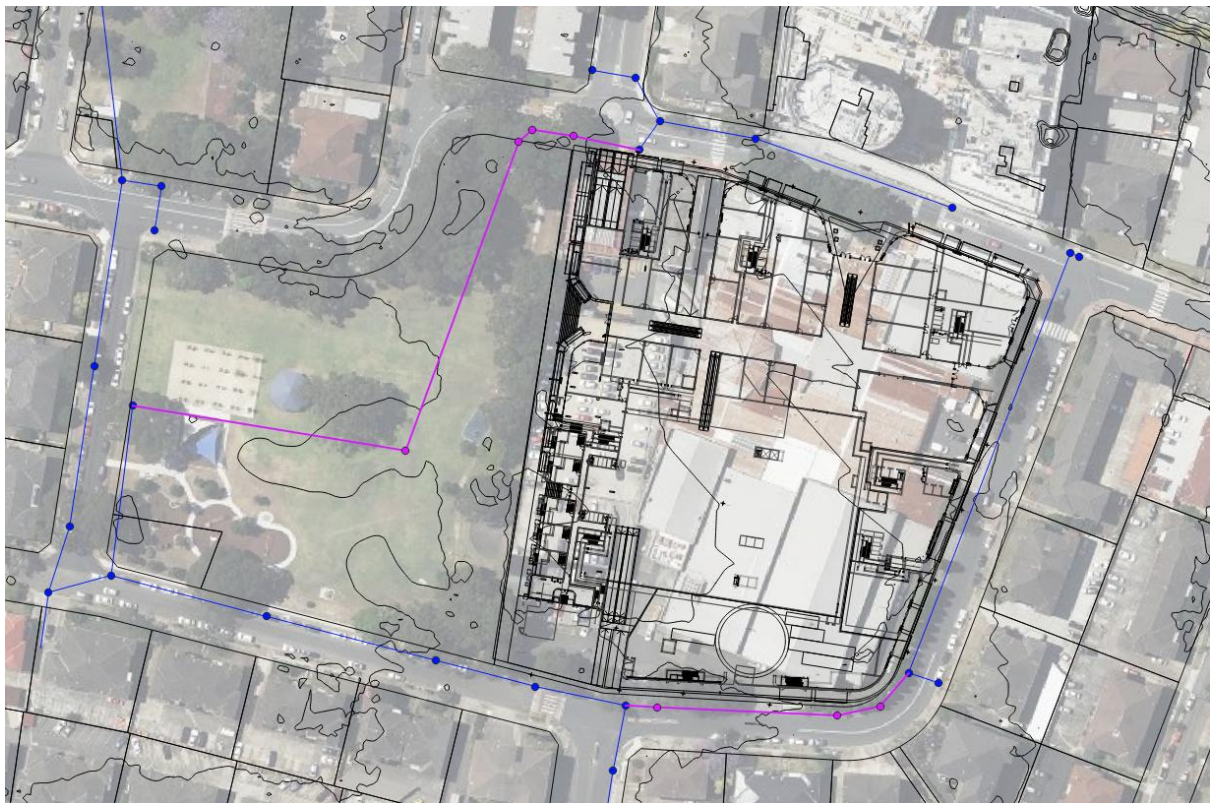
Proposed Drainage (Purple) and Existing Drainage (Blue) Network
